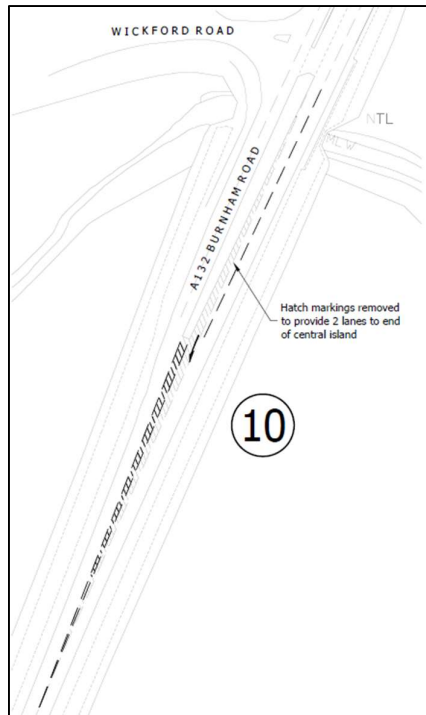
Modification to Burnham Road South of the Burnham Road/Ferrers Grove/Willow Road Roundabout
